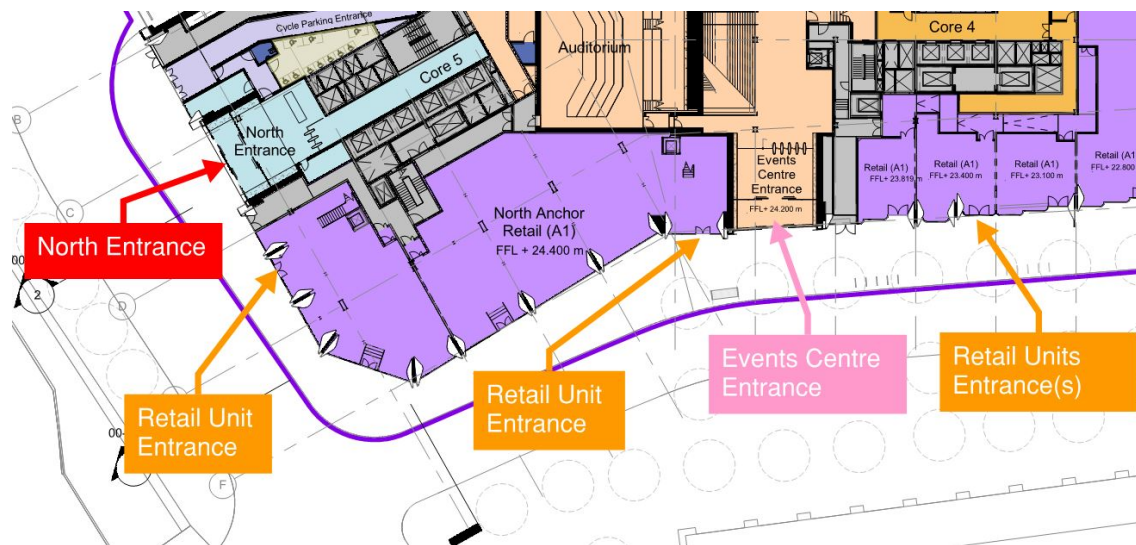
North end of the building showing the Events Centre, North Entrance and the North Anchor retail units
